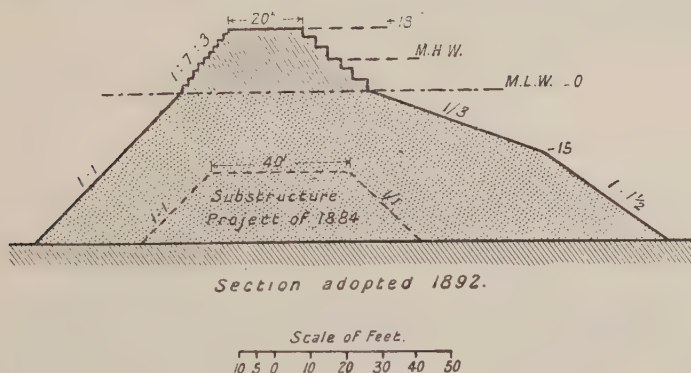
Section of Breakwater, Sandy Bay, U.S.A.
